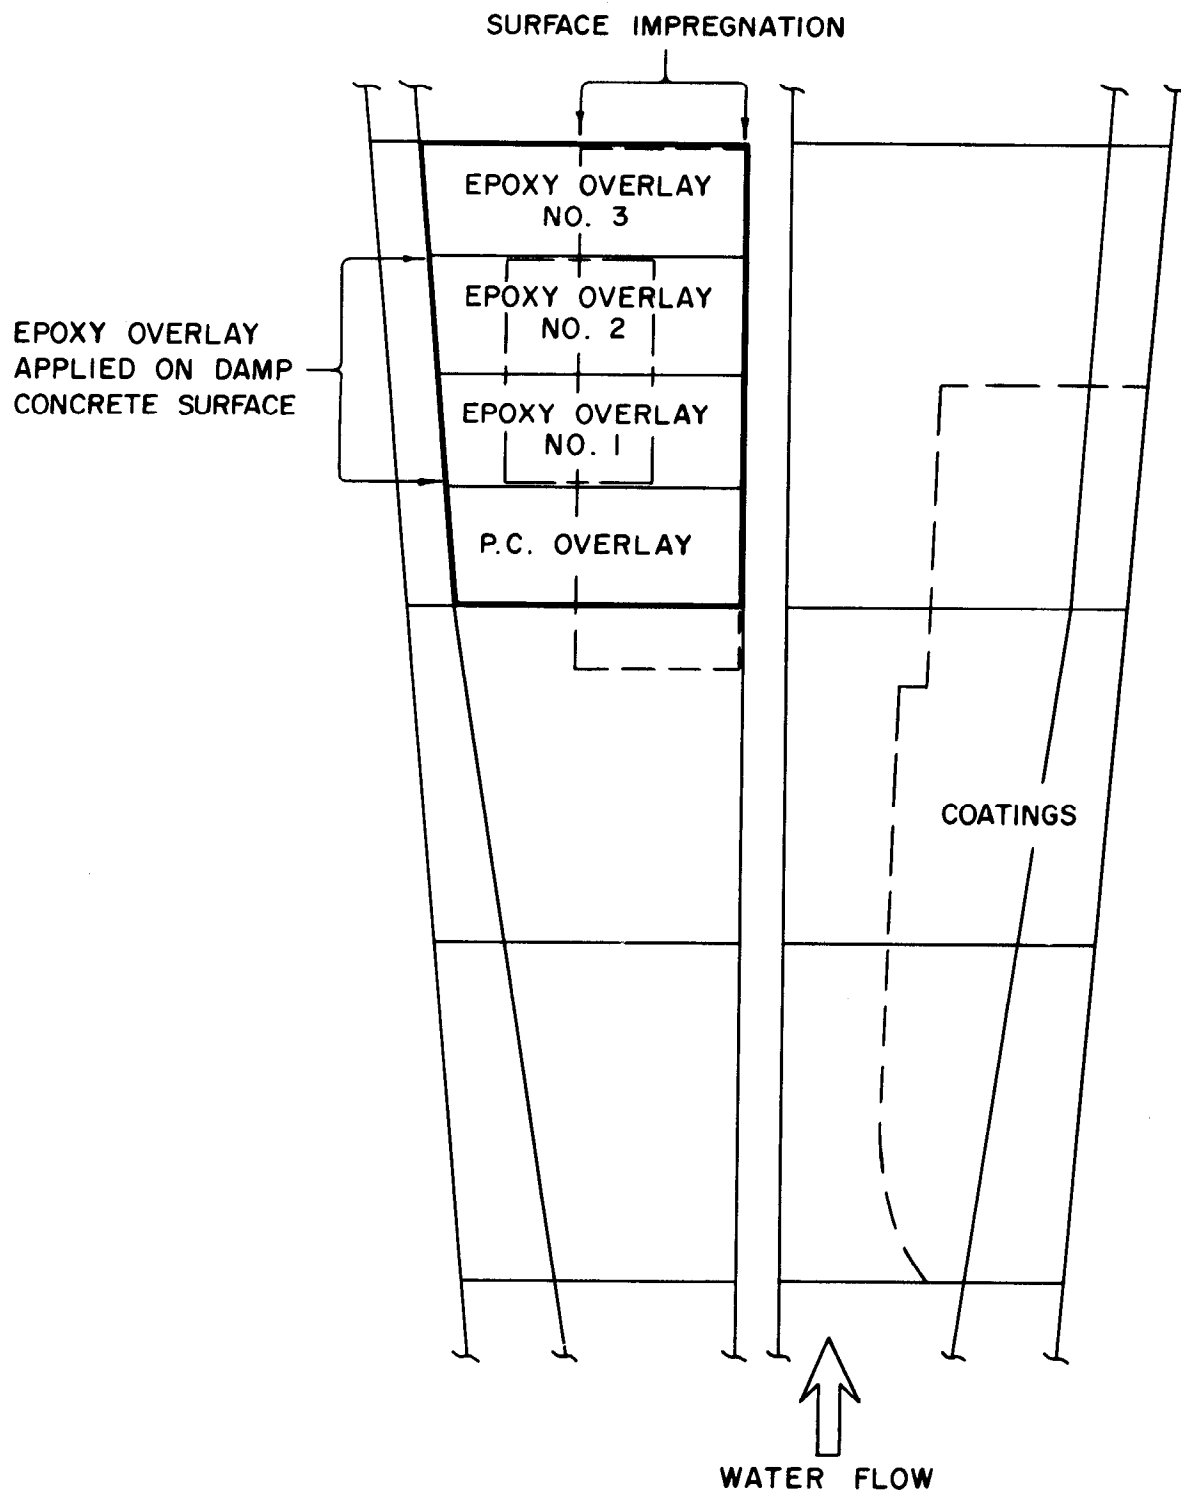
Sketch shows schematic layout for the experimental repairs on the floor of the Shadow Mountain Spillway.
